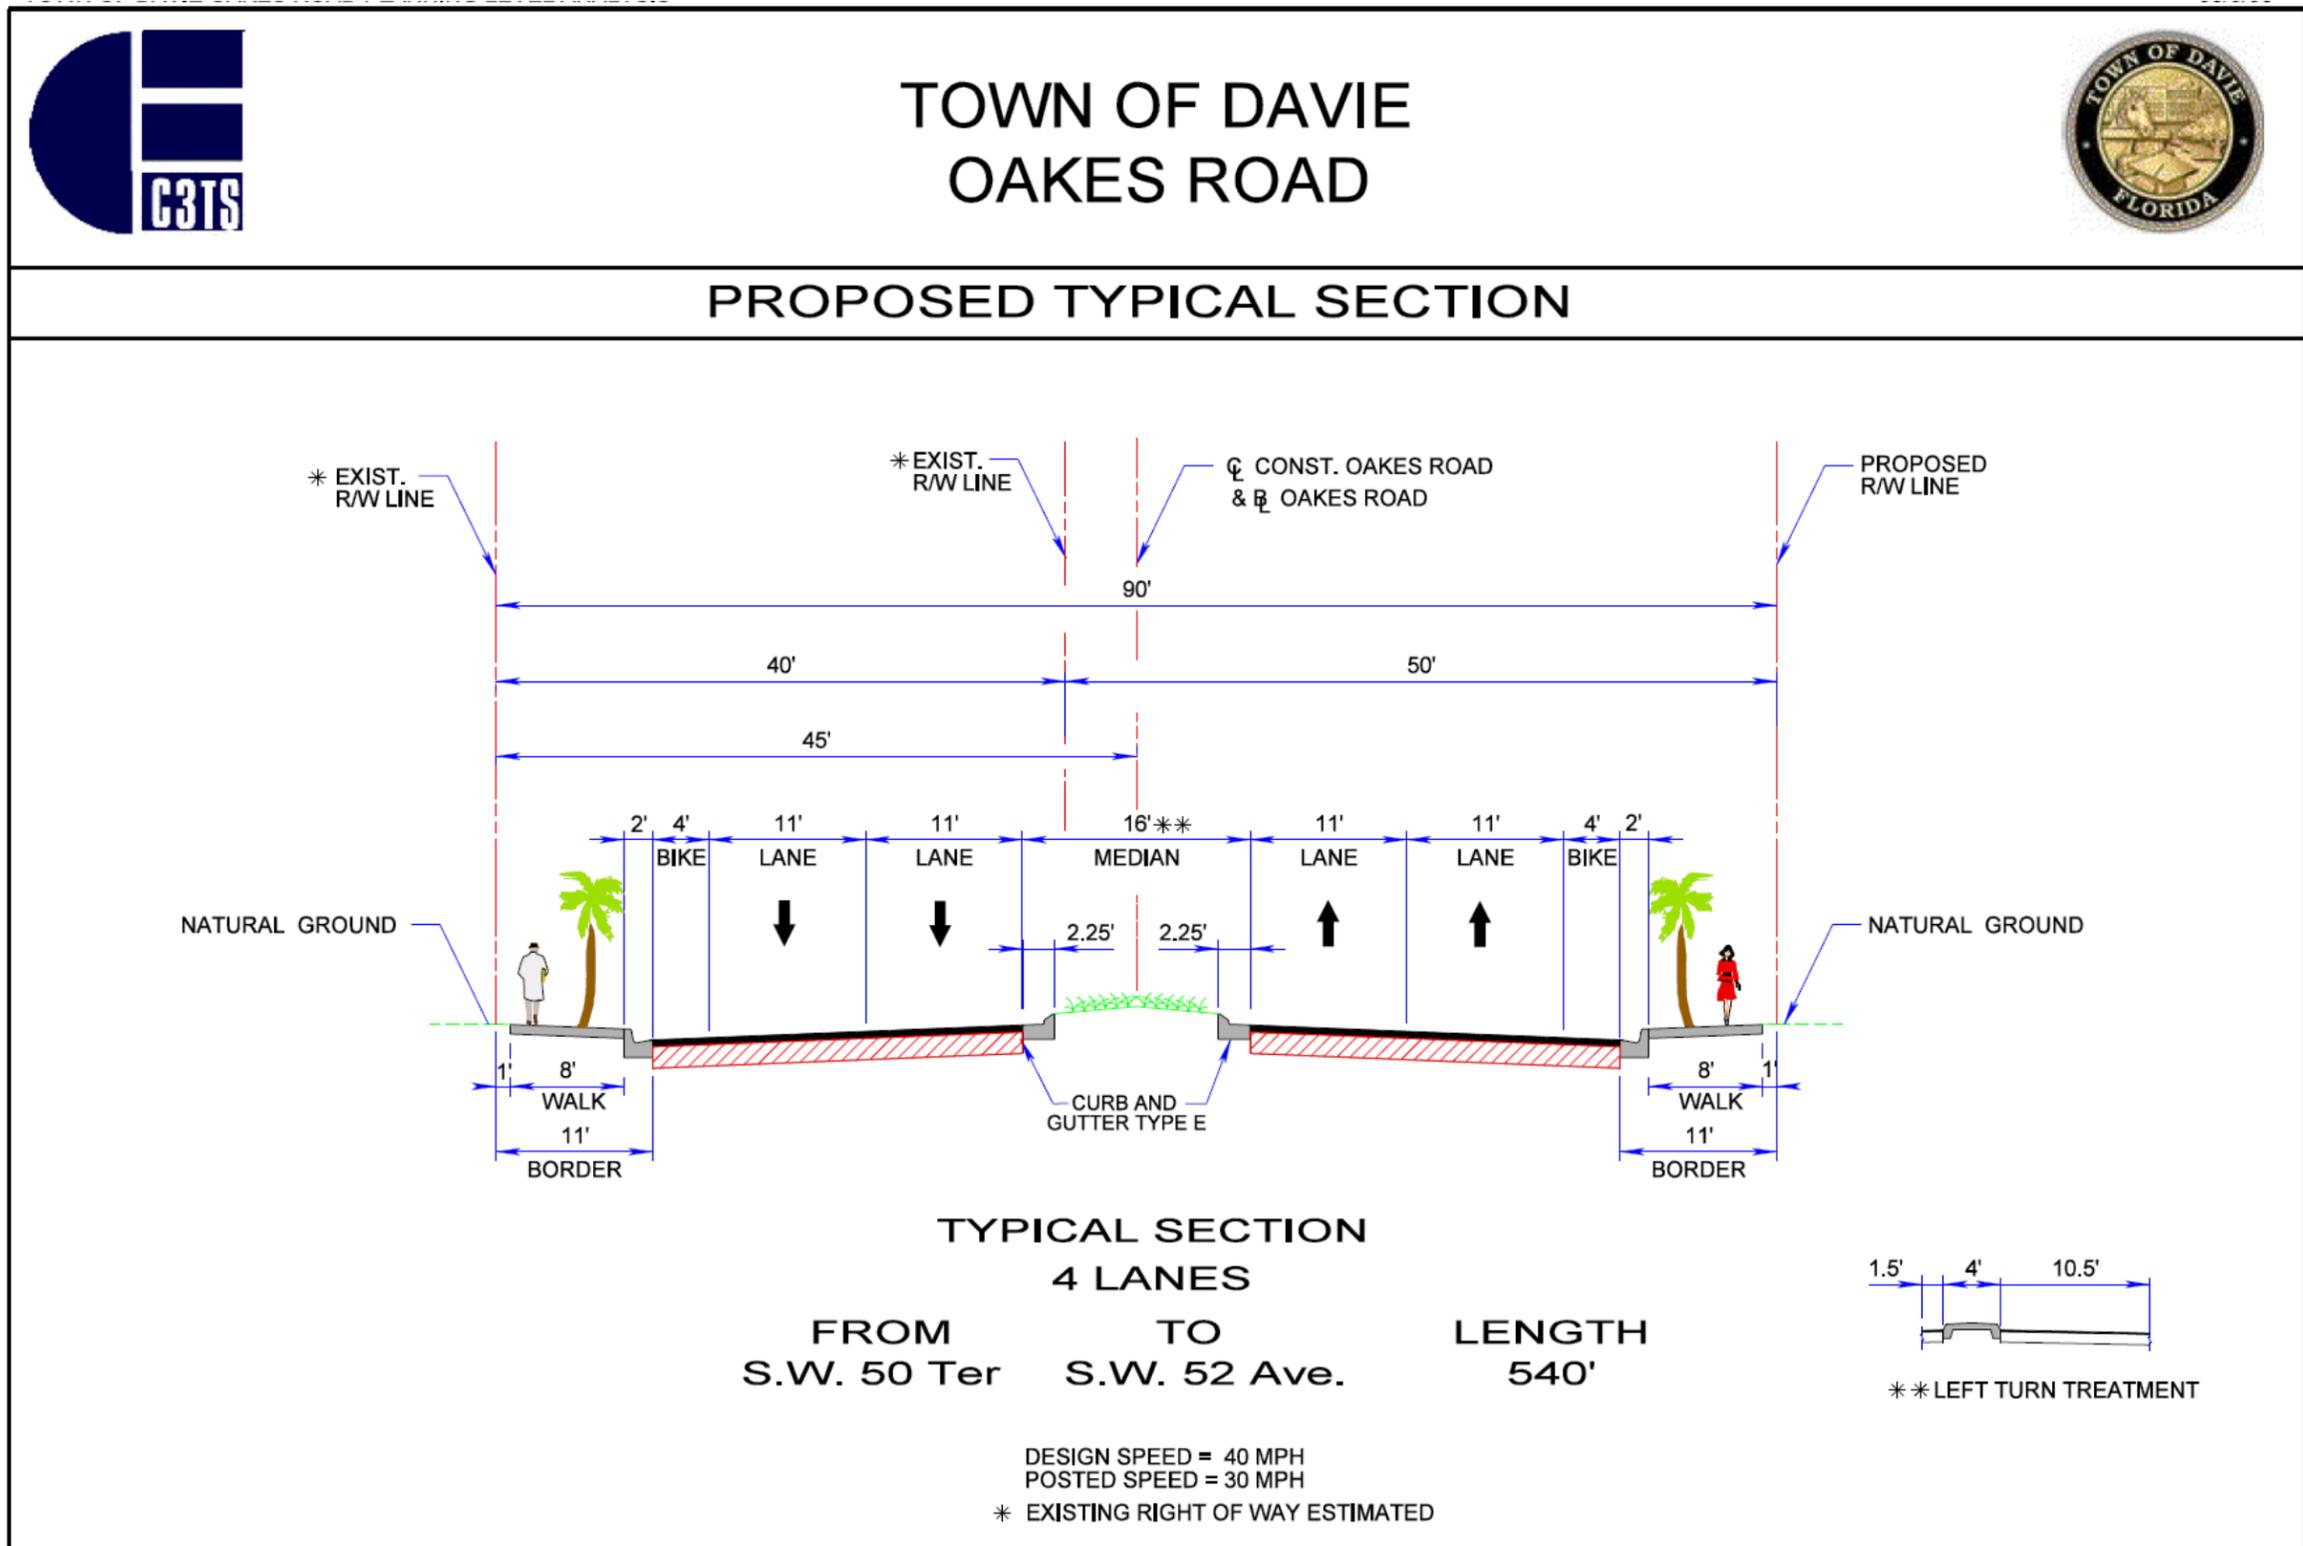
; Oakes Road Typical Section From SW 50 Ter. To SW 52 Ave
